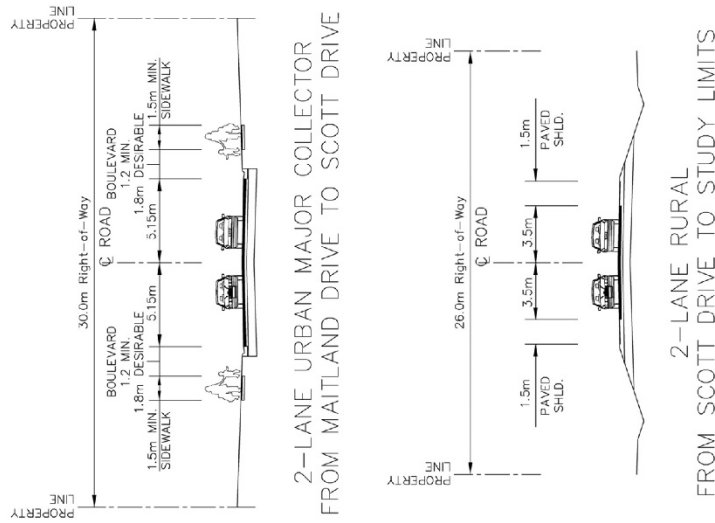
Technically Preferred Alternative for Farnham Road Cross Section
